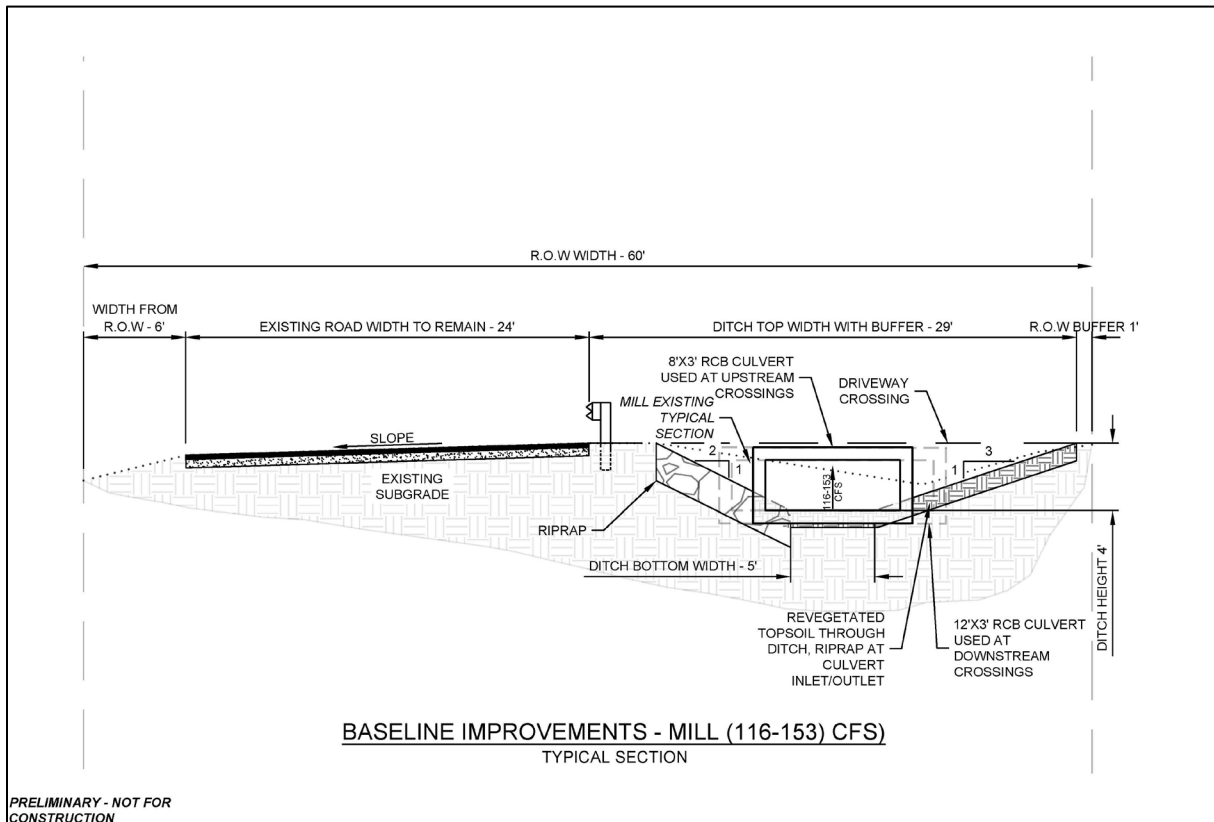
Typical section for the roadside ditch and RCB culvert layout along Mill Road.
